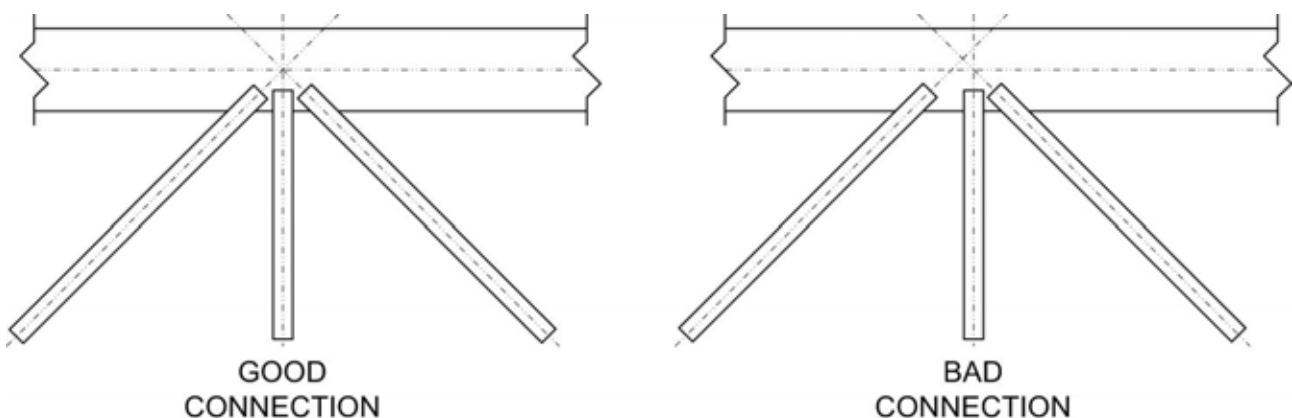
Sketch showing an acceptable connection and an eccentric connection that is to be avoided.
